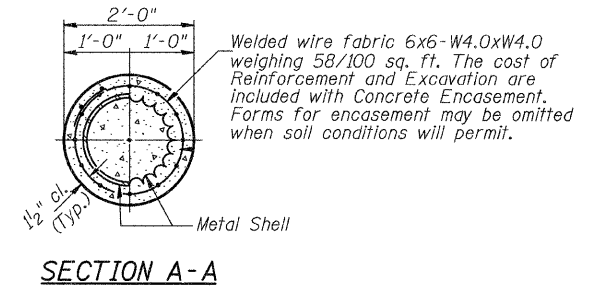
DETAIL OF CYLINDRICAL STEEL SHELL FOR CAST IN PLACE CONCRETE PILES
